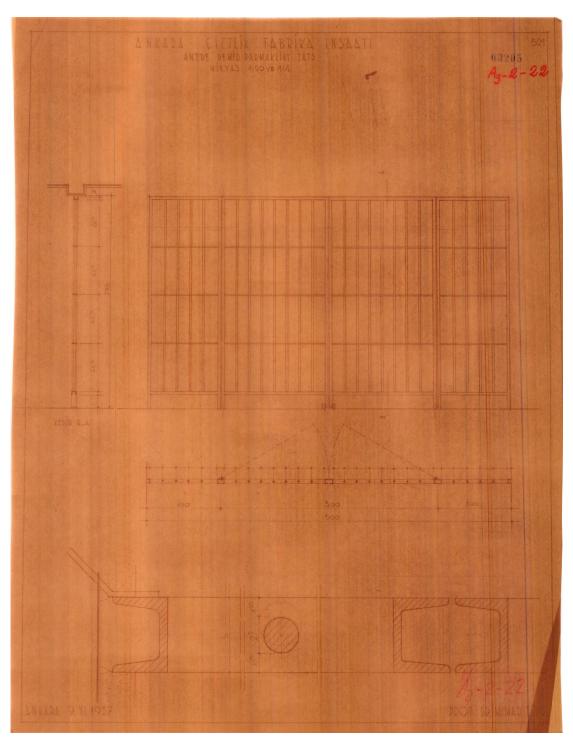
The original drawings of the brewery, iron balustrade details (Source T.T.A. Archive)
